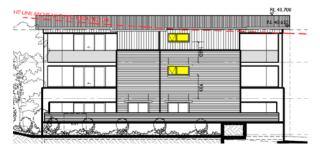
Eastern elevation of RFB with U13 and U20 windows highlighted
